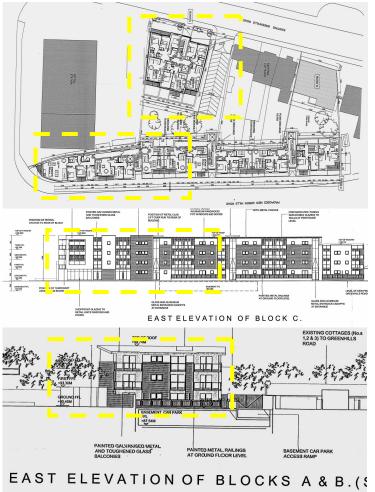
SITE PLAN AND ELEVATIONS FOR REFUSED APPEAL, REG. REF. PL06S.204649
